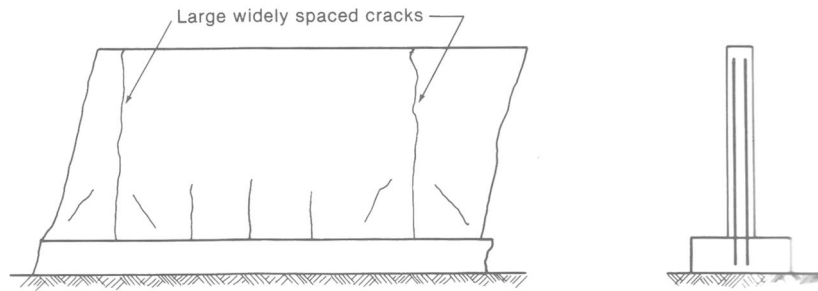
Shrinkage cracks in a wall due to restrained contraction. [3, p.322]
